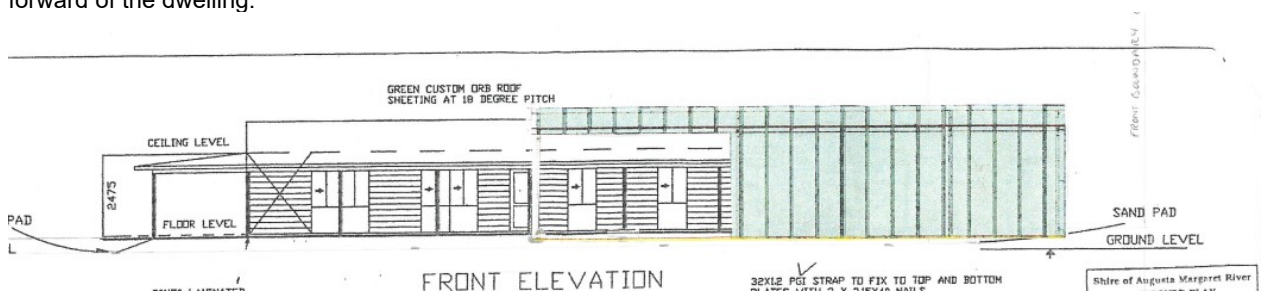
Streetscape elevation with proposed shed forward of dwelling
